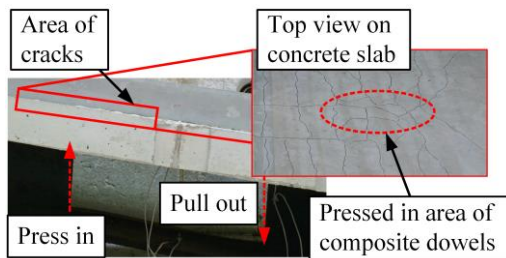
Displacement of web opening and crack pattern caused by the pressed in composite dowel on top of the concrete slab.
